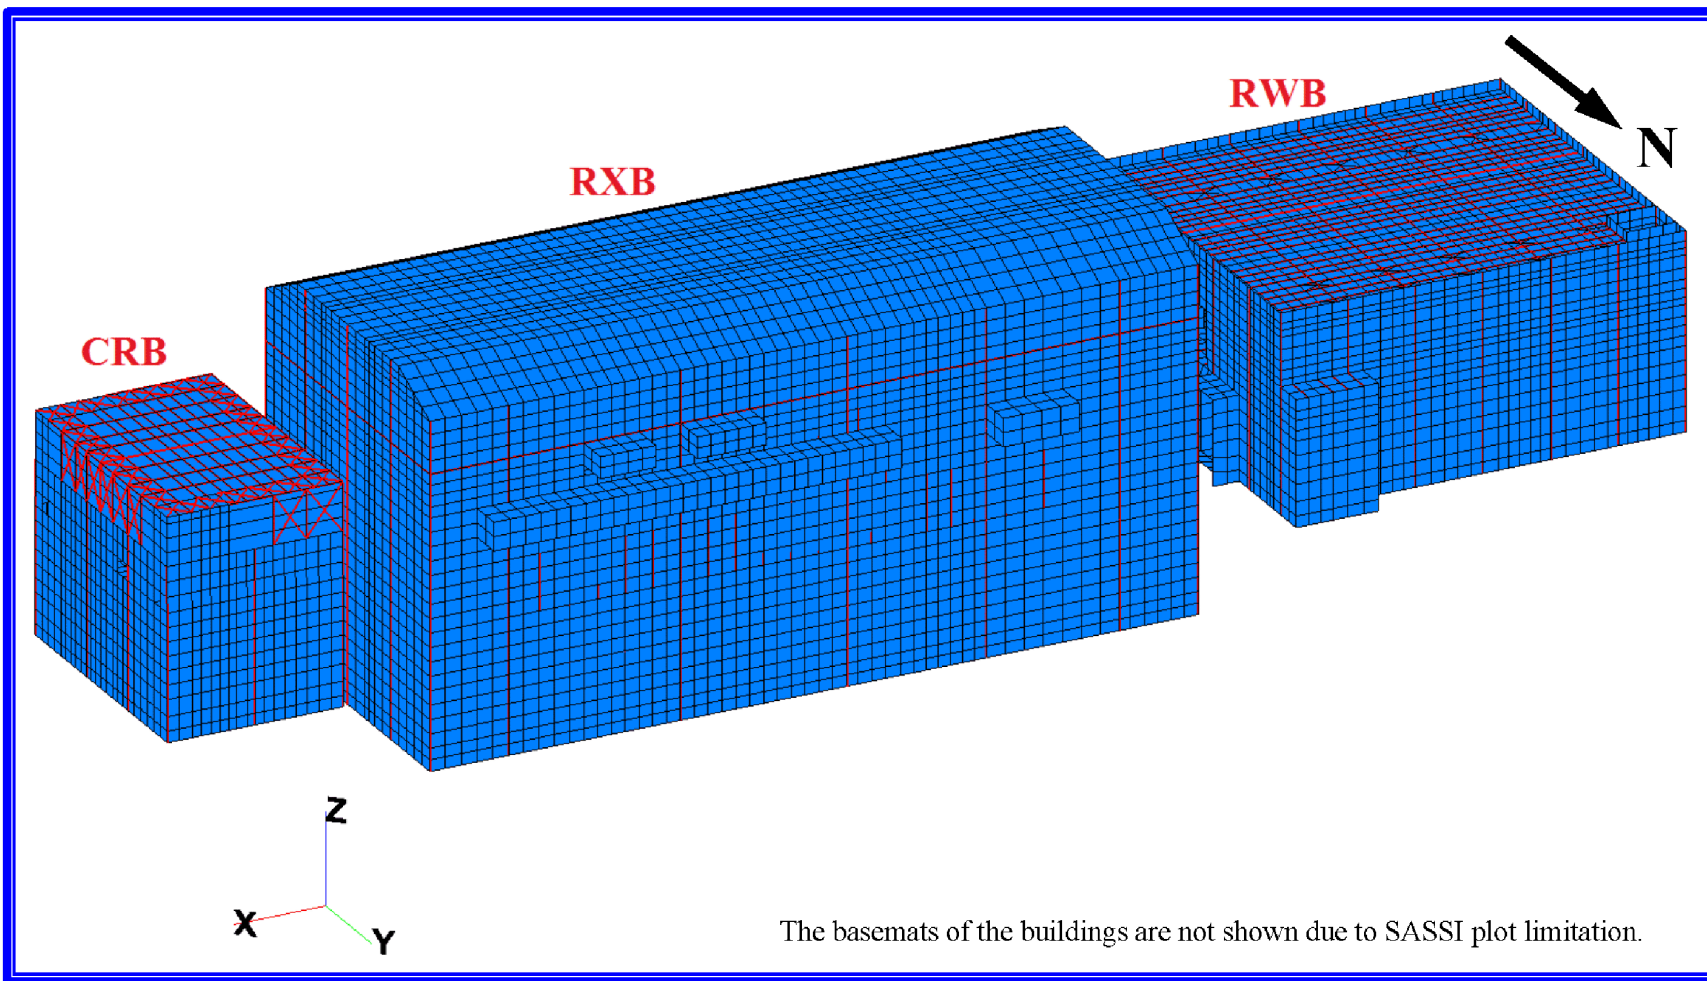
SASI2010 Triple Building Model Showing South Side of Three Buildings (Looking Northwest)
